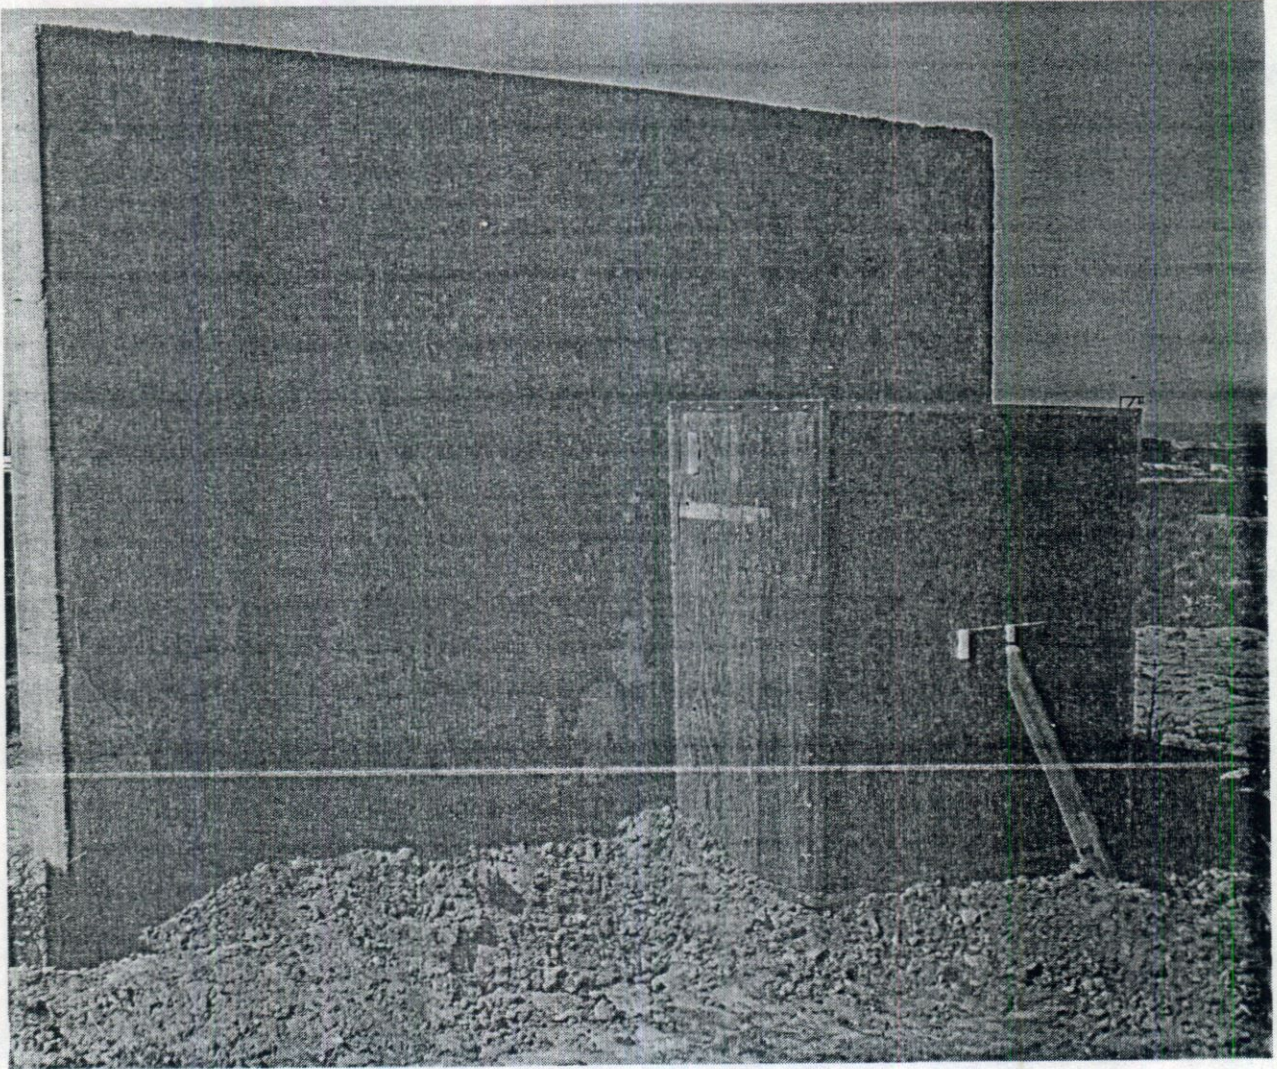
Stand-Off Wall with Explosive Charge in Place
